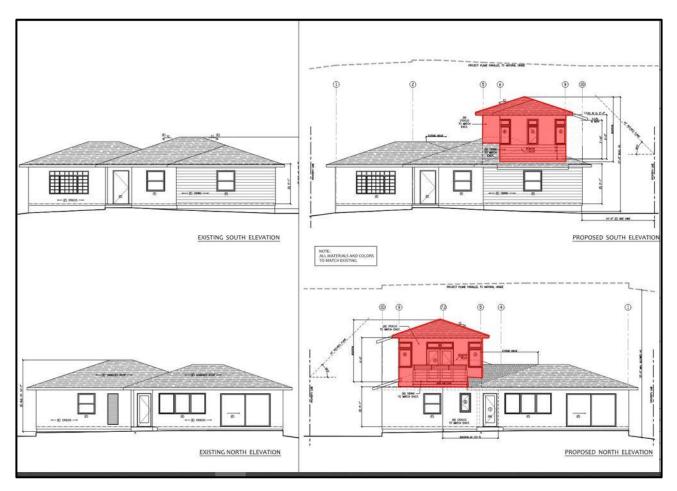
Elevation of proposed development with 2nd story additions shown in red
